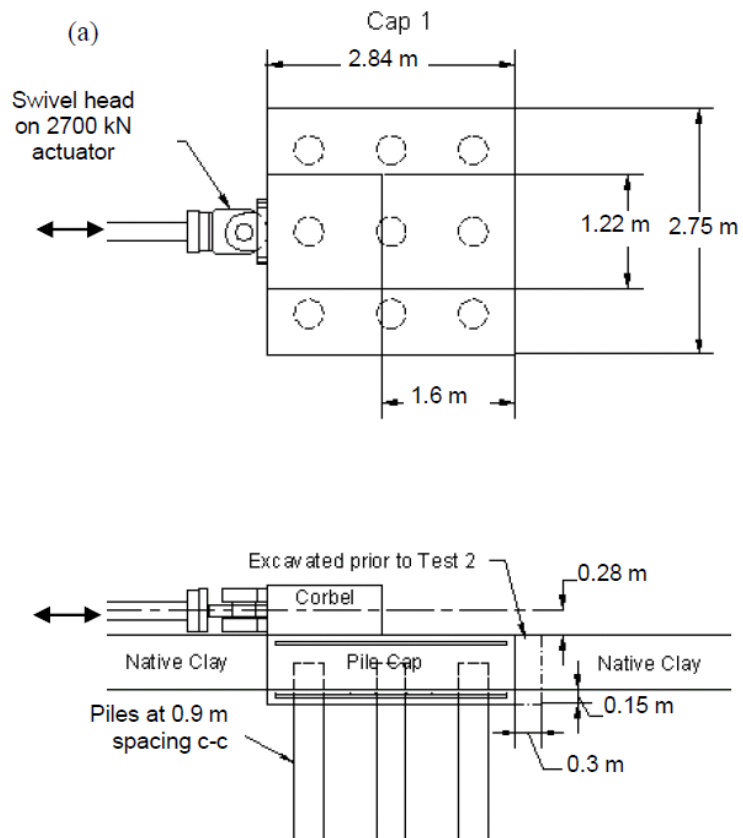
Plan and profile drawings of pile groups in untreated virgin clay (Rollins et al., 2010)
